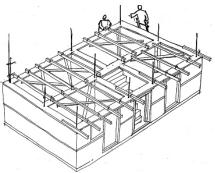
B: Seismic Strengthening: Floor Horizontal Bracing and Vertical Reinforcement Bars
